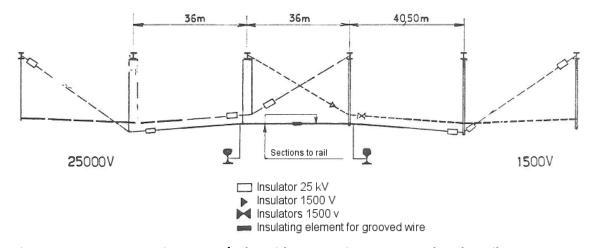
System separation 1500V/25kV with two sections connected to the rail
